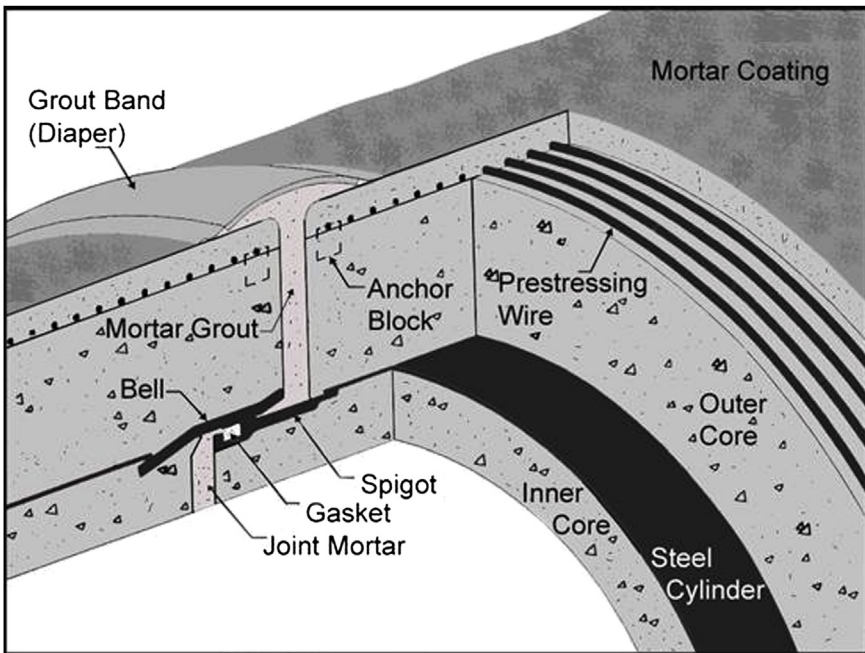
Cross-section of a prestressed concrete cylinder pipe, ECP-type Ojdrovic, 2013.
